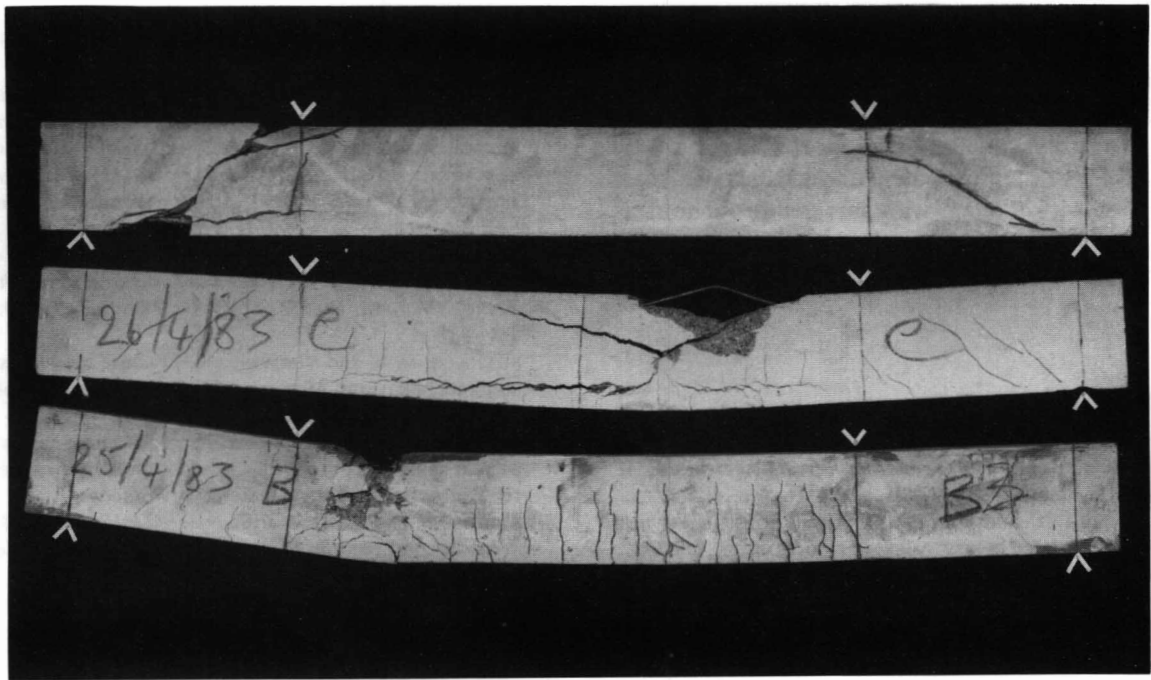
Figure V: Modes of failure exhibited by beams without stirrups with $a_v/d < 2.0$.
